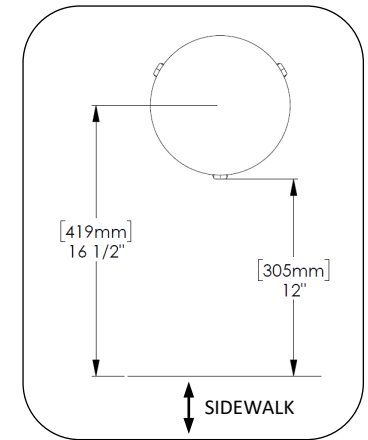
RECOMMENDED SETBACK FROM SIDEWALK
